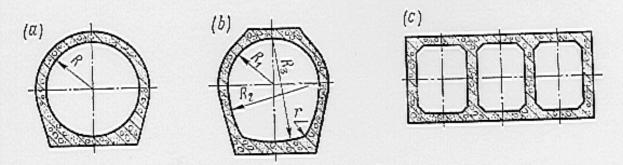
Types of inverted siphon cross-sections (a) circular; (b) box-shaped; (c) rectangular multi-barrel 13-01578
